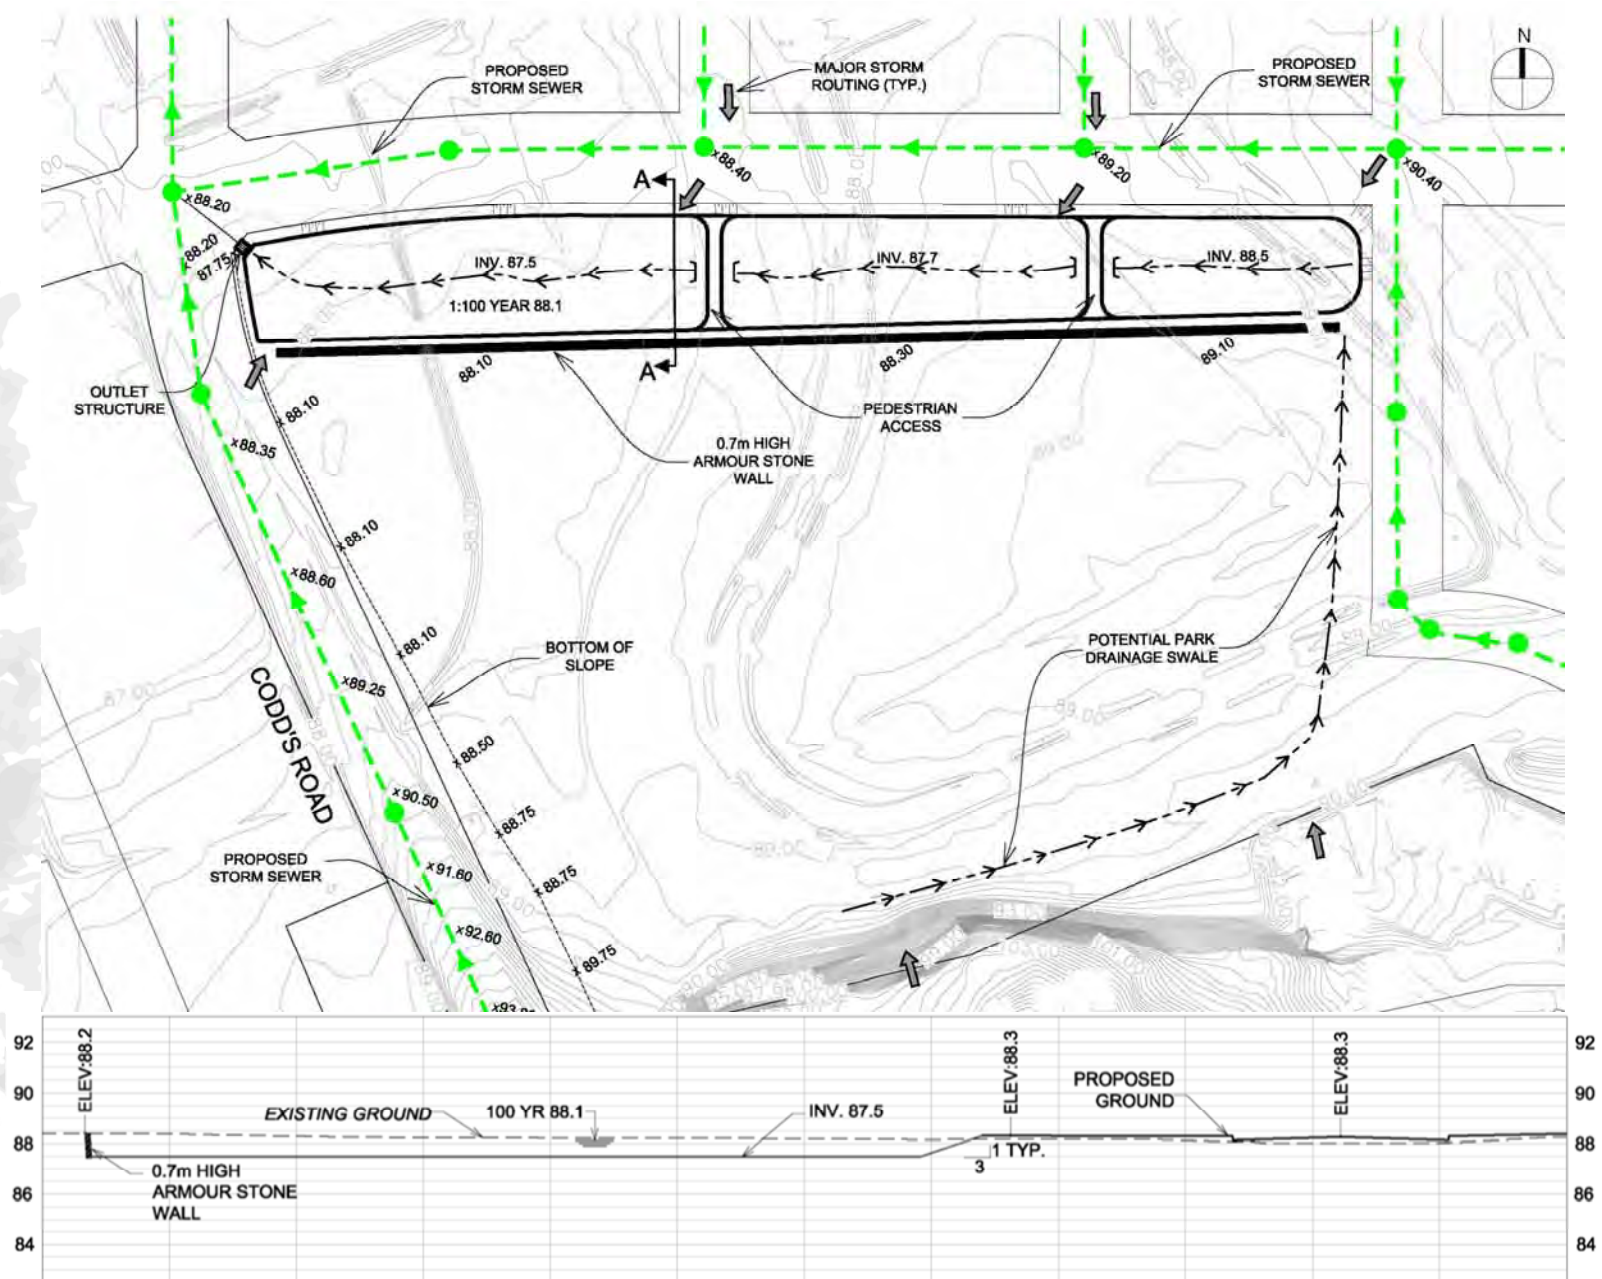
Park Dry Pond - Plan View and Cross Section A-A
